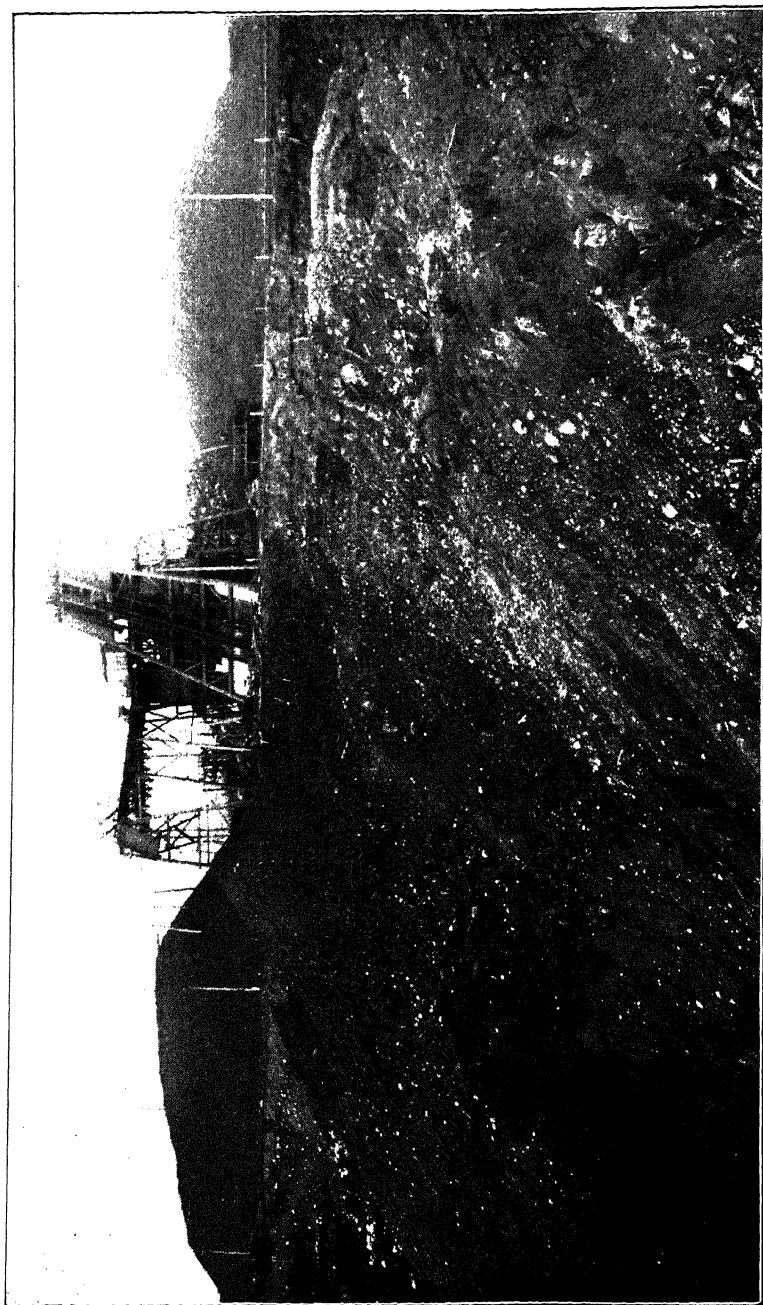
View Showing No. 3 Shaft and a Portion of the Cave, Chandler Mine.
